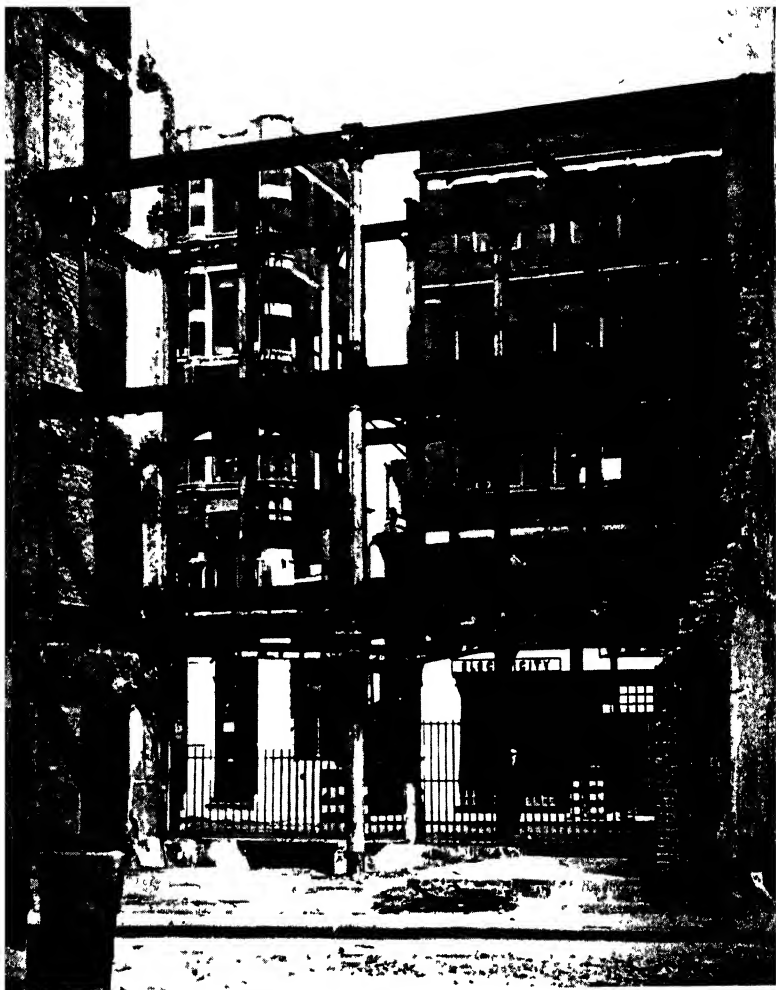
An all-iron structure, built about 1870 in Old Street, Finsbury, London. Air raid damage again discloses the use of cast iron columns as vertical members. The structure recalls the technique set forth in William Fairbairn's book, from which some drawings are reproduced on pages 56 to 62.
